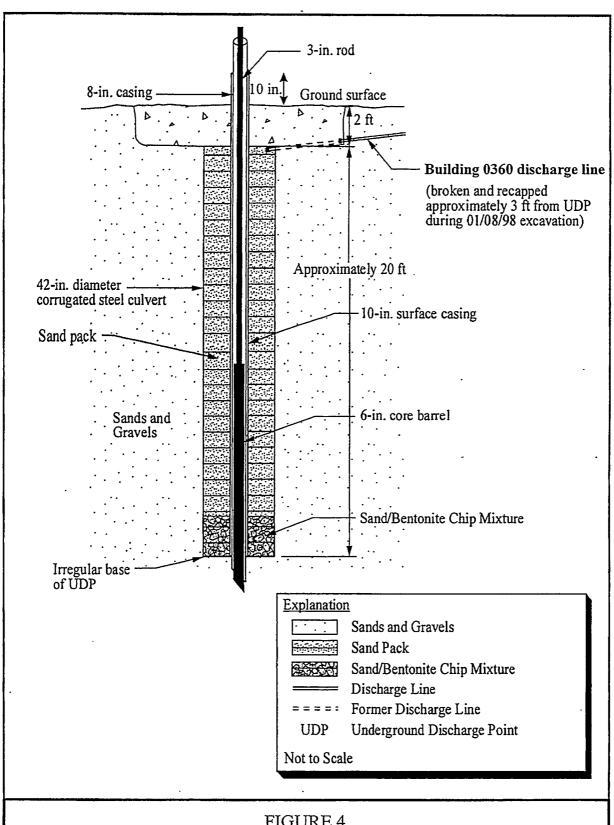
CONFIGURATION OF BUILDING 0360 UNDERGROUND DISCHARGE POINT DRILLING STRATEGY (CADD, DOE 1998)
